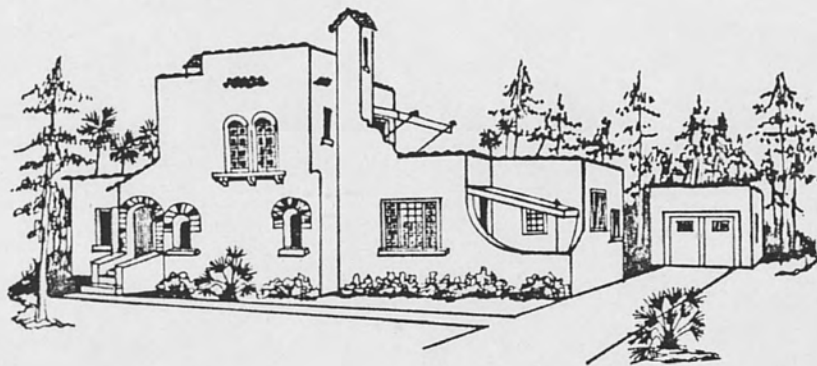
Coral Gables masonry house. (Redrawn and adapted from Plans for Concrete Houses 1925)
